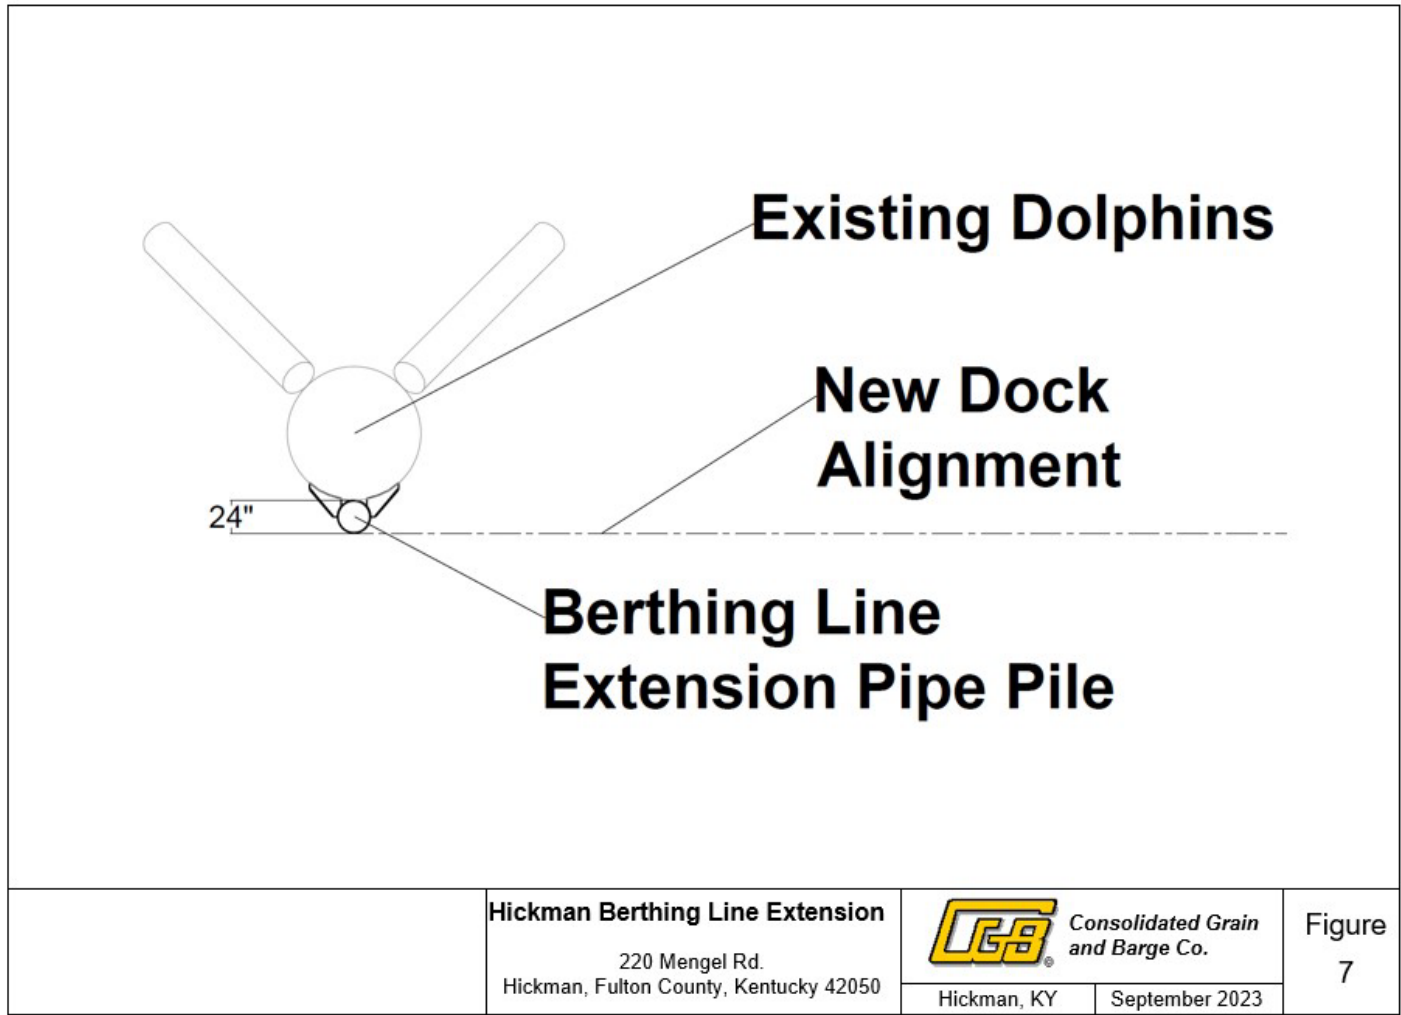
Proposed Section 408 project features, Consolidated Grain and Barge, Hickman, KY showing proposed new dock alignment.
